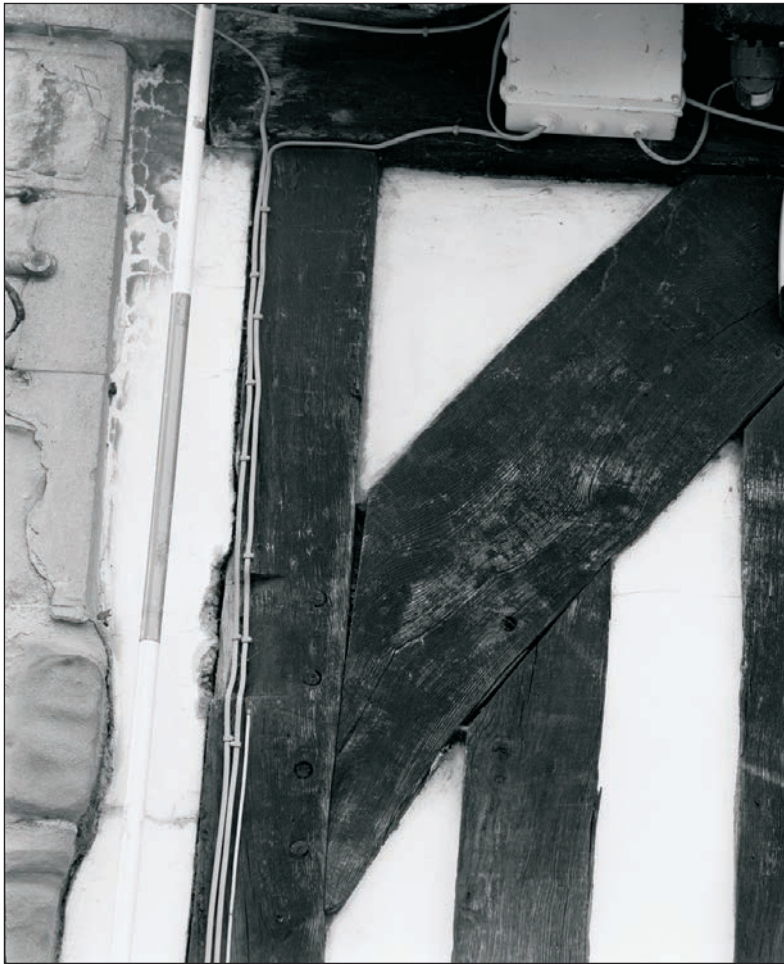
Detail of the eastern post with pegged arched brace, north elevation, Building 2 (note absence of further peg holes on east of upright post) (Film 09.10)
